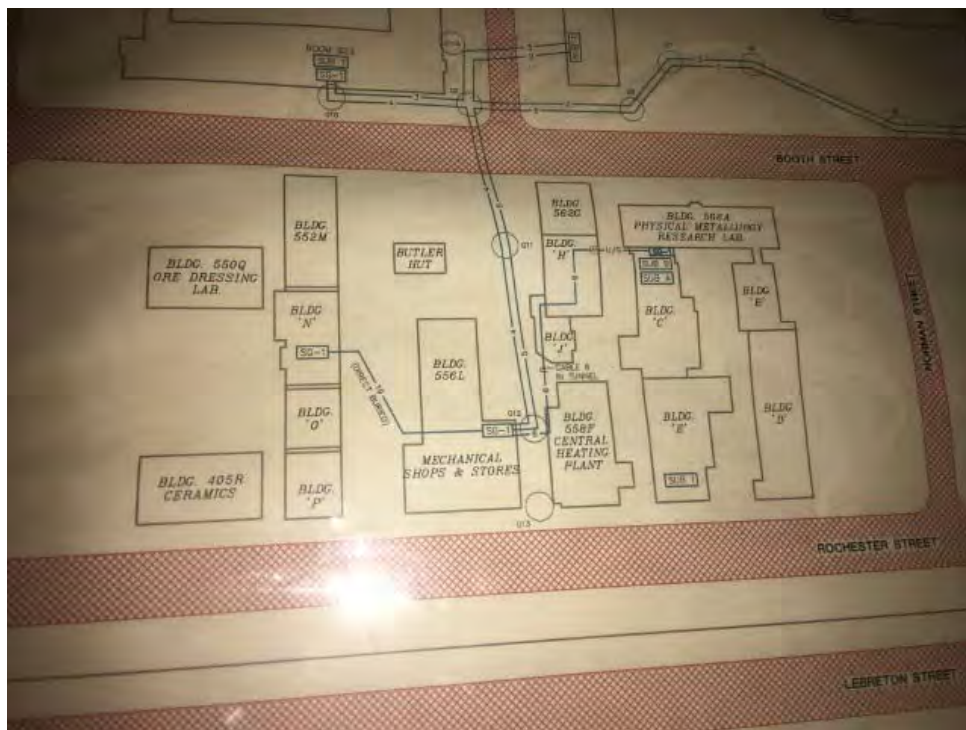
Plan on the Site and underground service tunnel that was located on a wall at 552 Booth Street.
